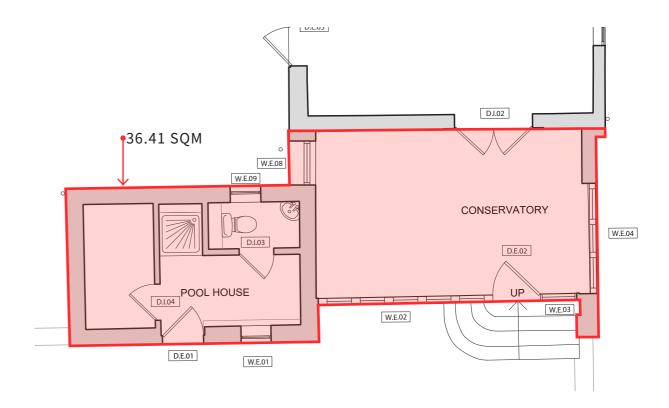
Existing extension ground floor footprint (36.41 sqm)
